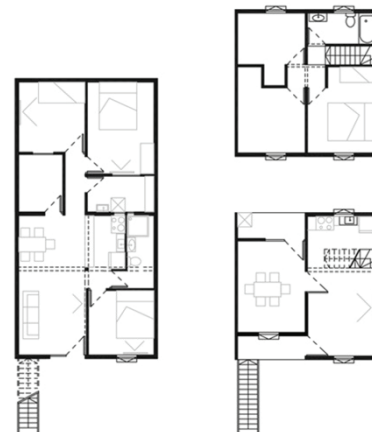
Floor plan of delivered basic house of Elemental Lo Espejo, first floor house (left), duplex house (right)
